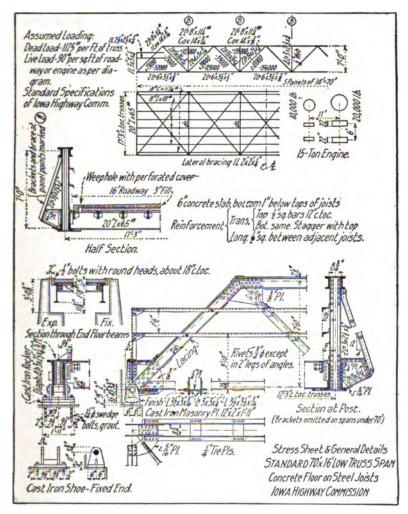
Low Truss Steel Highway Bridge, Concrete Floor on Steel Stringers.
